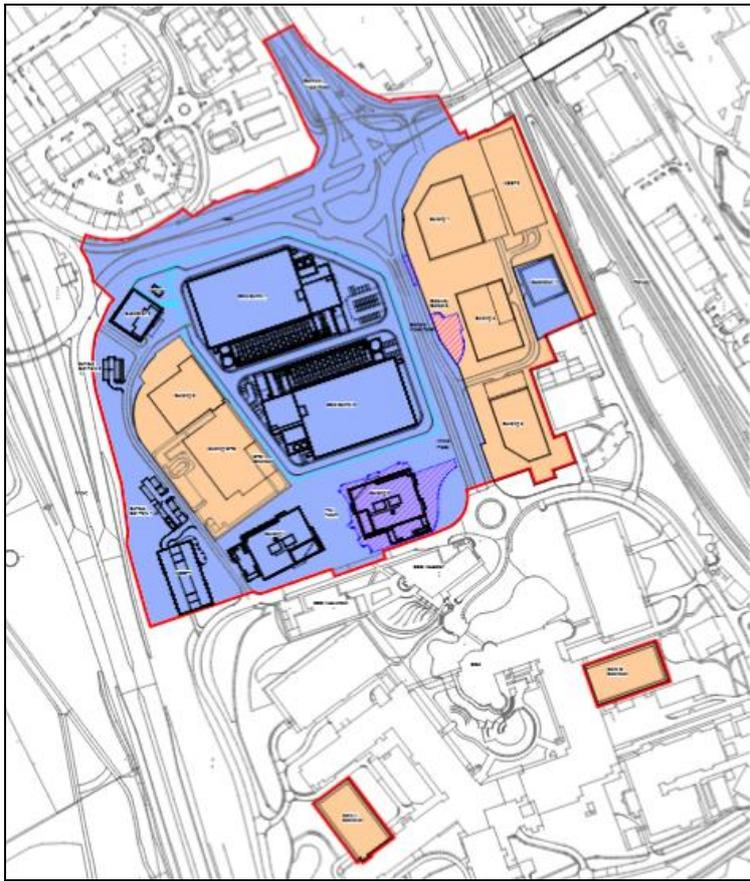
Detail and Outline Boundary Plan (purple zone is detailed)
